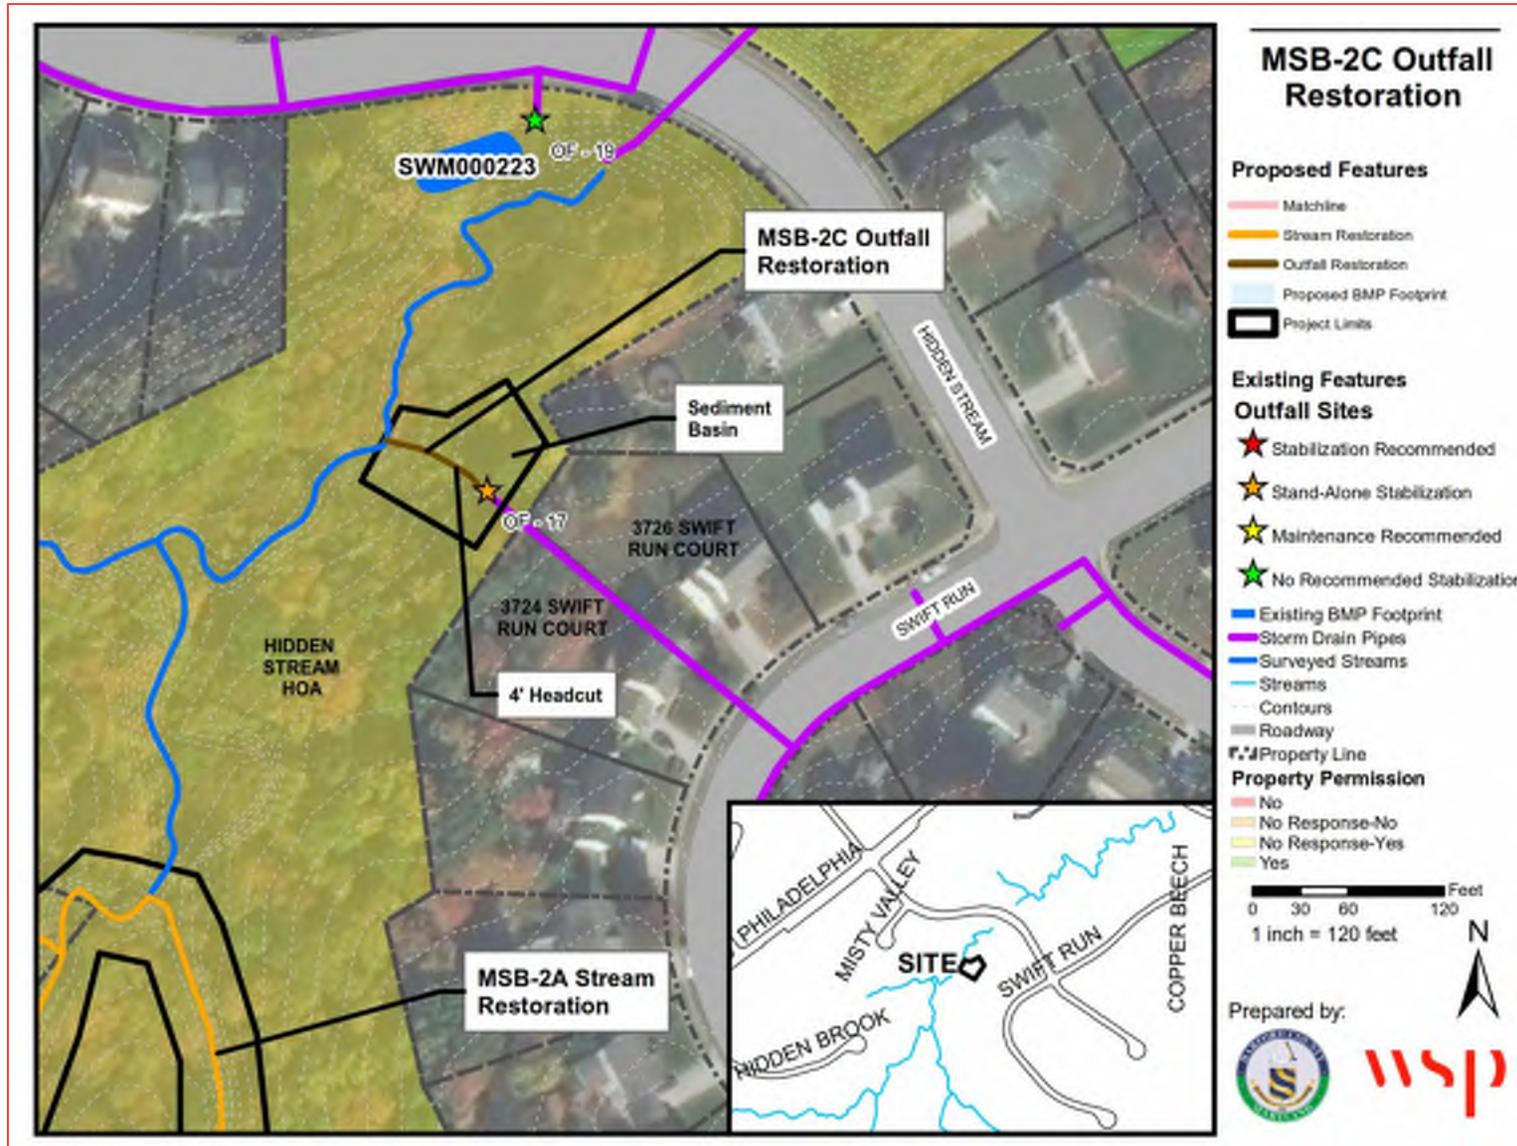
Site Location and Proposed Project Plan for MSB-2C Outfall Restoration
